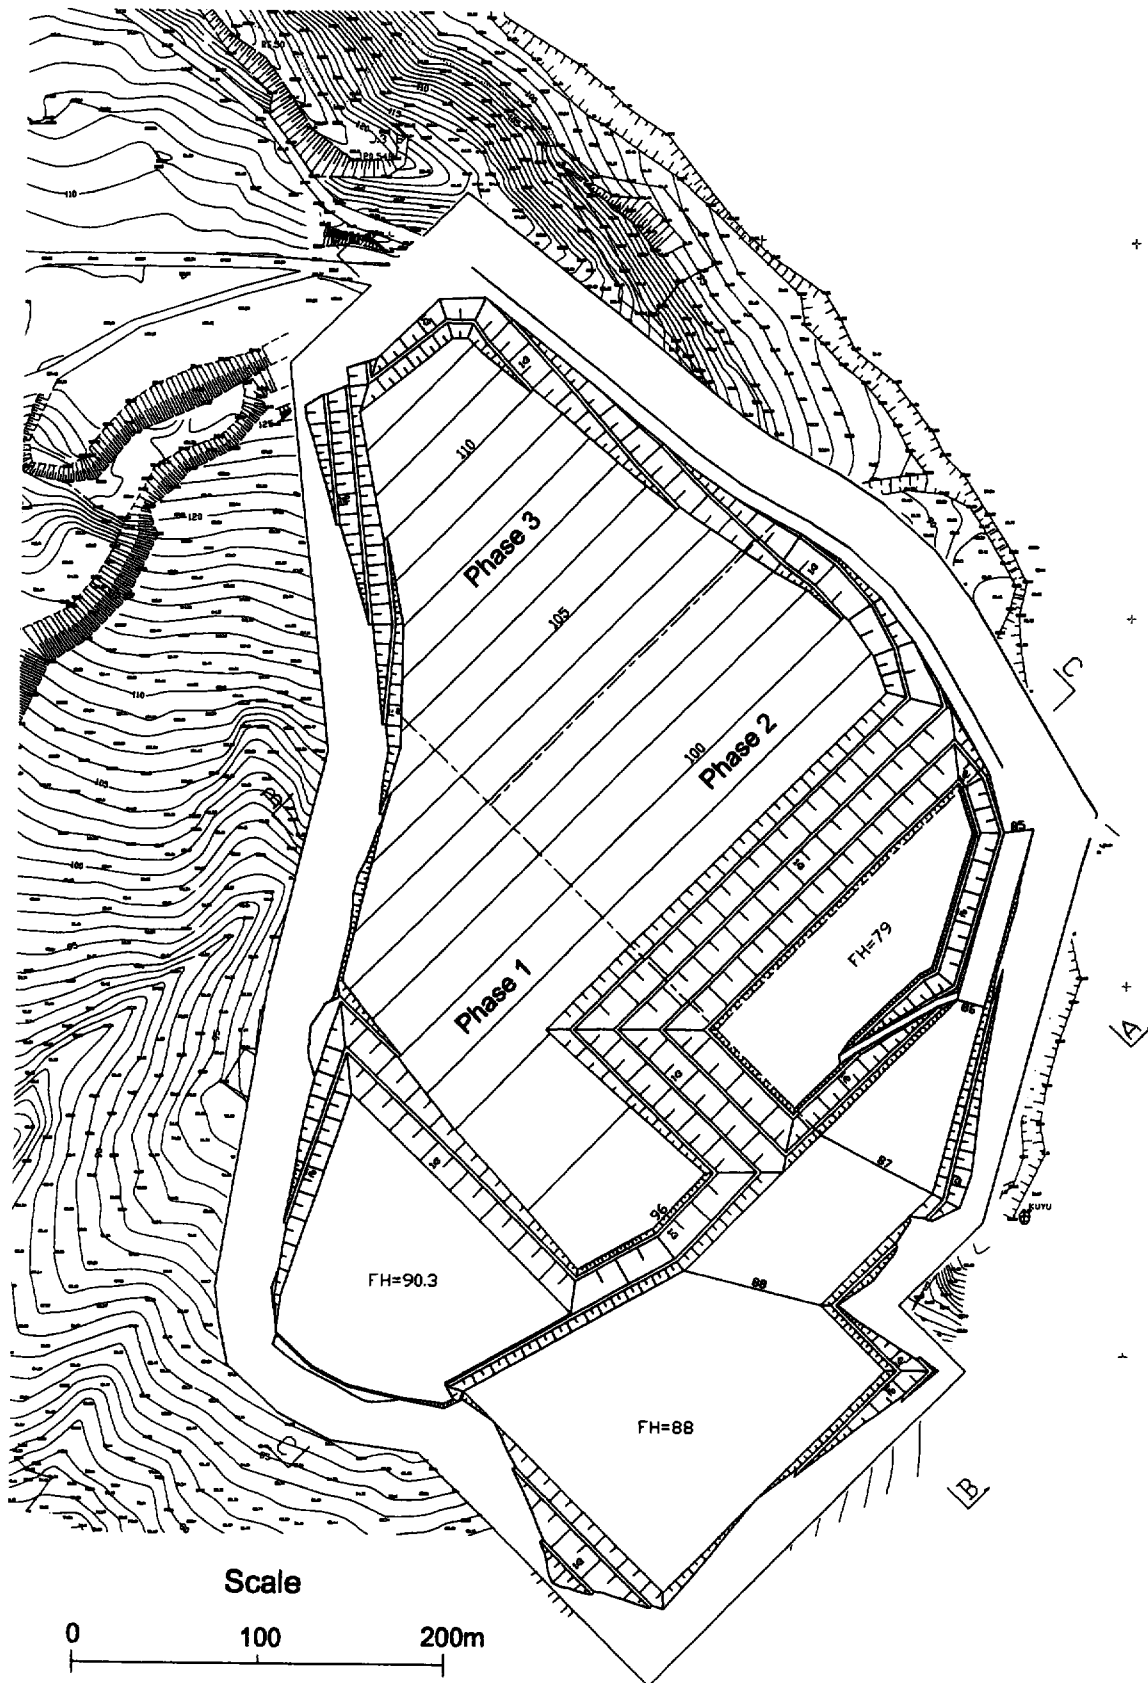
The Condition of Proposed Landfill Site at Final Cover Stage in Cimsa
